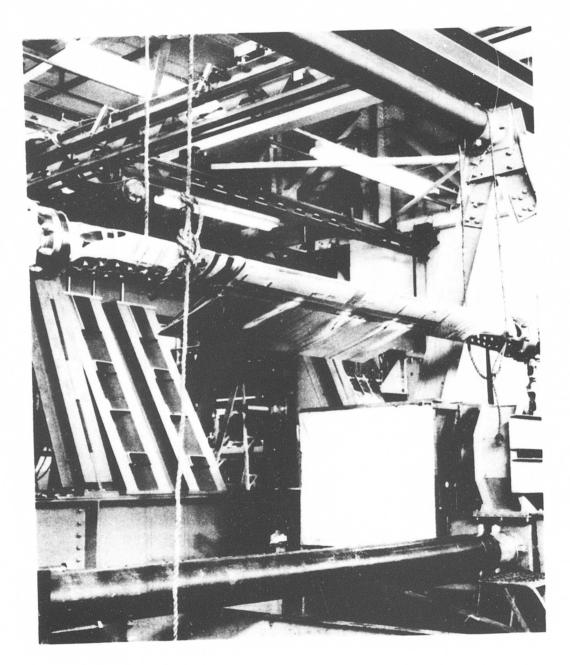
Specimen in 100K Lb Fatigue Test Machine.
